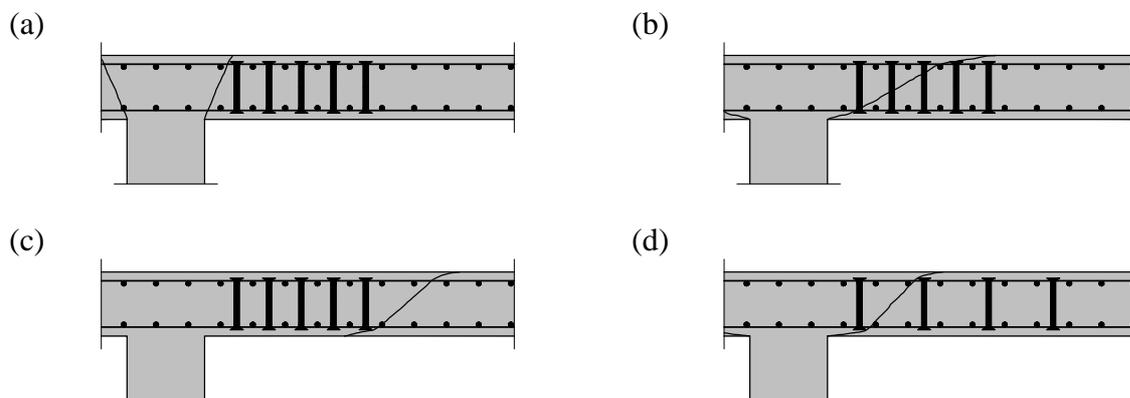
Possible failure modes of flat slabs with punching shear reinforcement: (a) failure of concrete struts close to the column; (b) failure within the region of the shear reinforcement; (c) failure outside the shear reinforced region; and (d) failure between the transverse reinforcement
